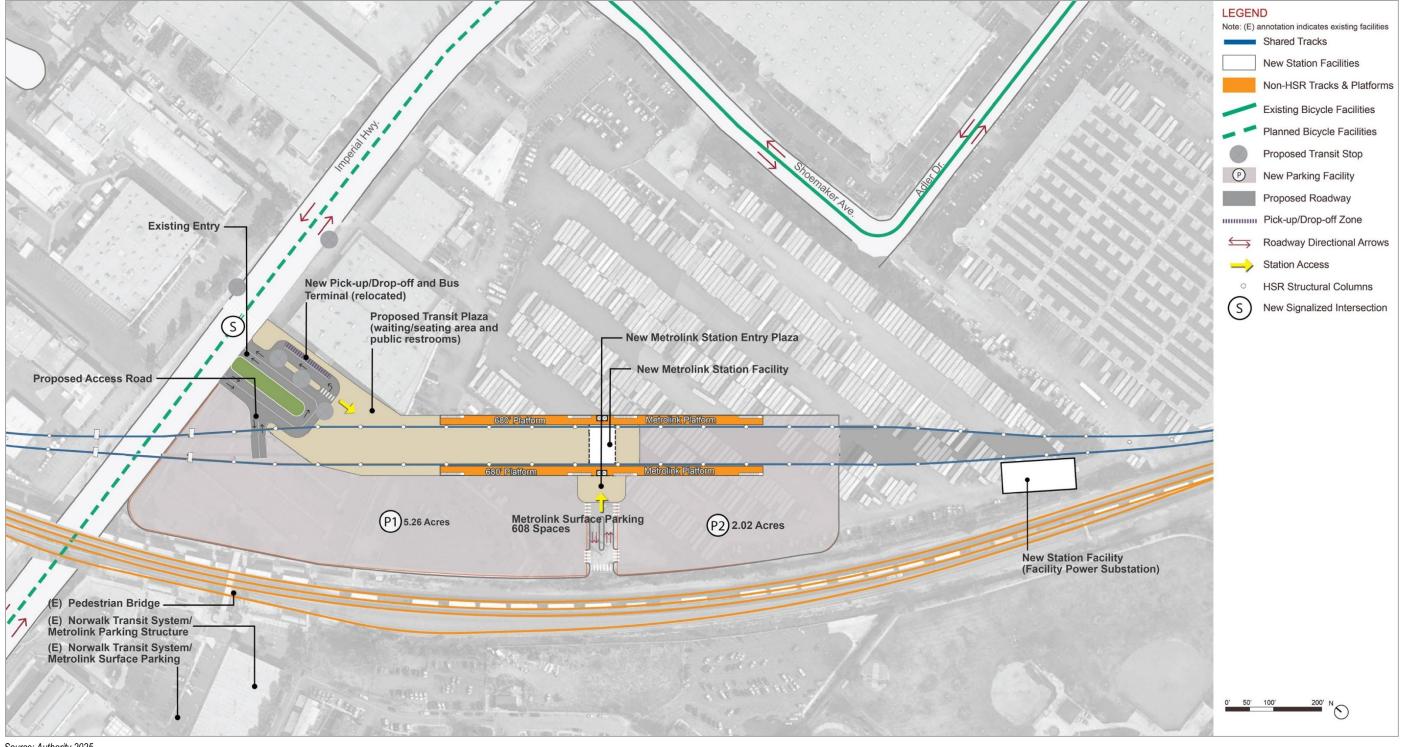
Modified Norwalk/Santa Fe Springs Metrolink Station Site Plan
